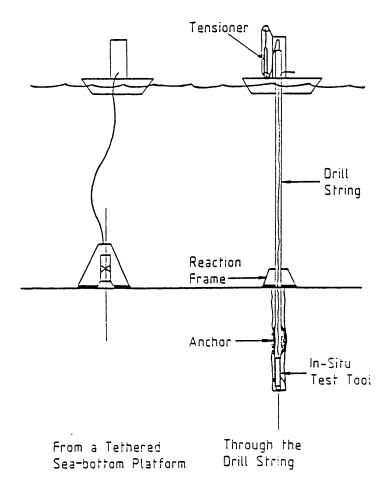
In-situ testing systems (Poulos (1988), Briaud and Meyer (1983))
